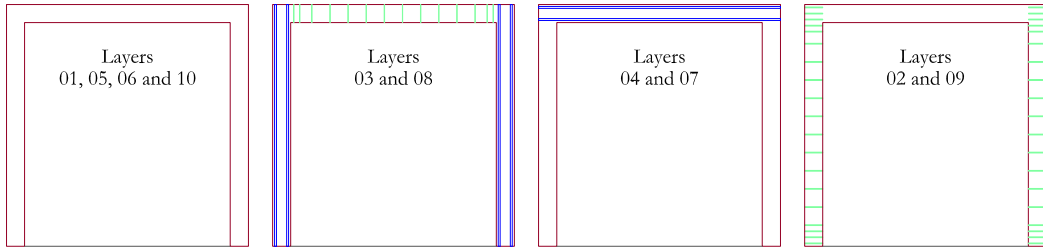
Geometry, crack patterns, loading and boundary conditions for cantilever wall with masonry in-fill
